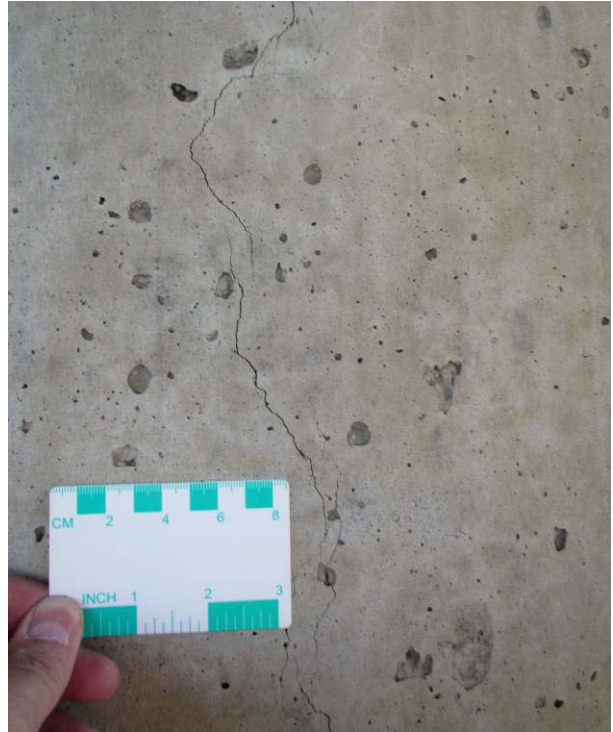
Condition of concrete columns of the South Parkway bridge over I-395.
